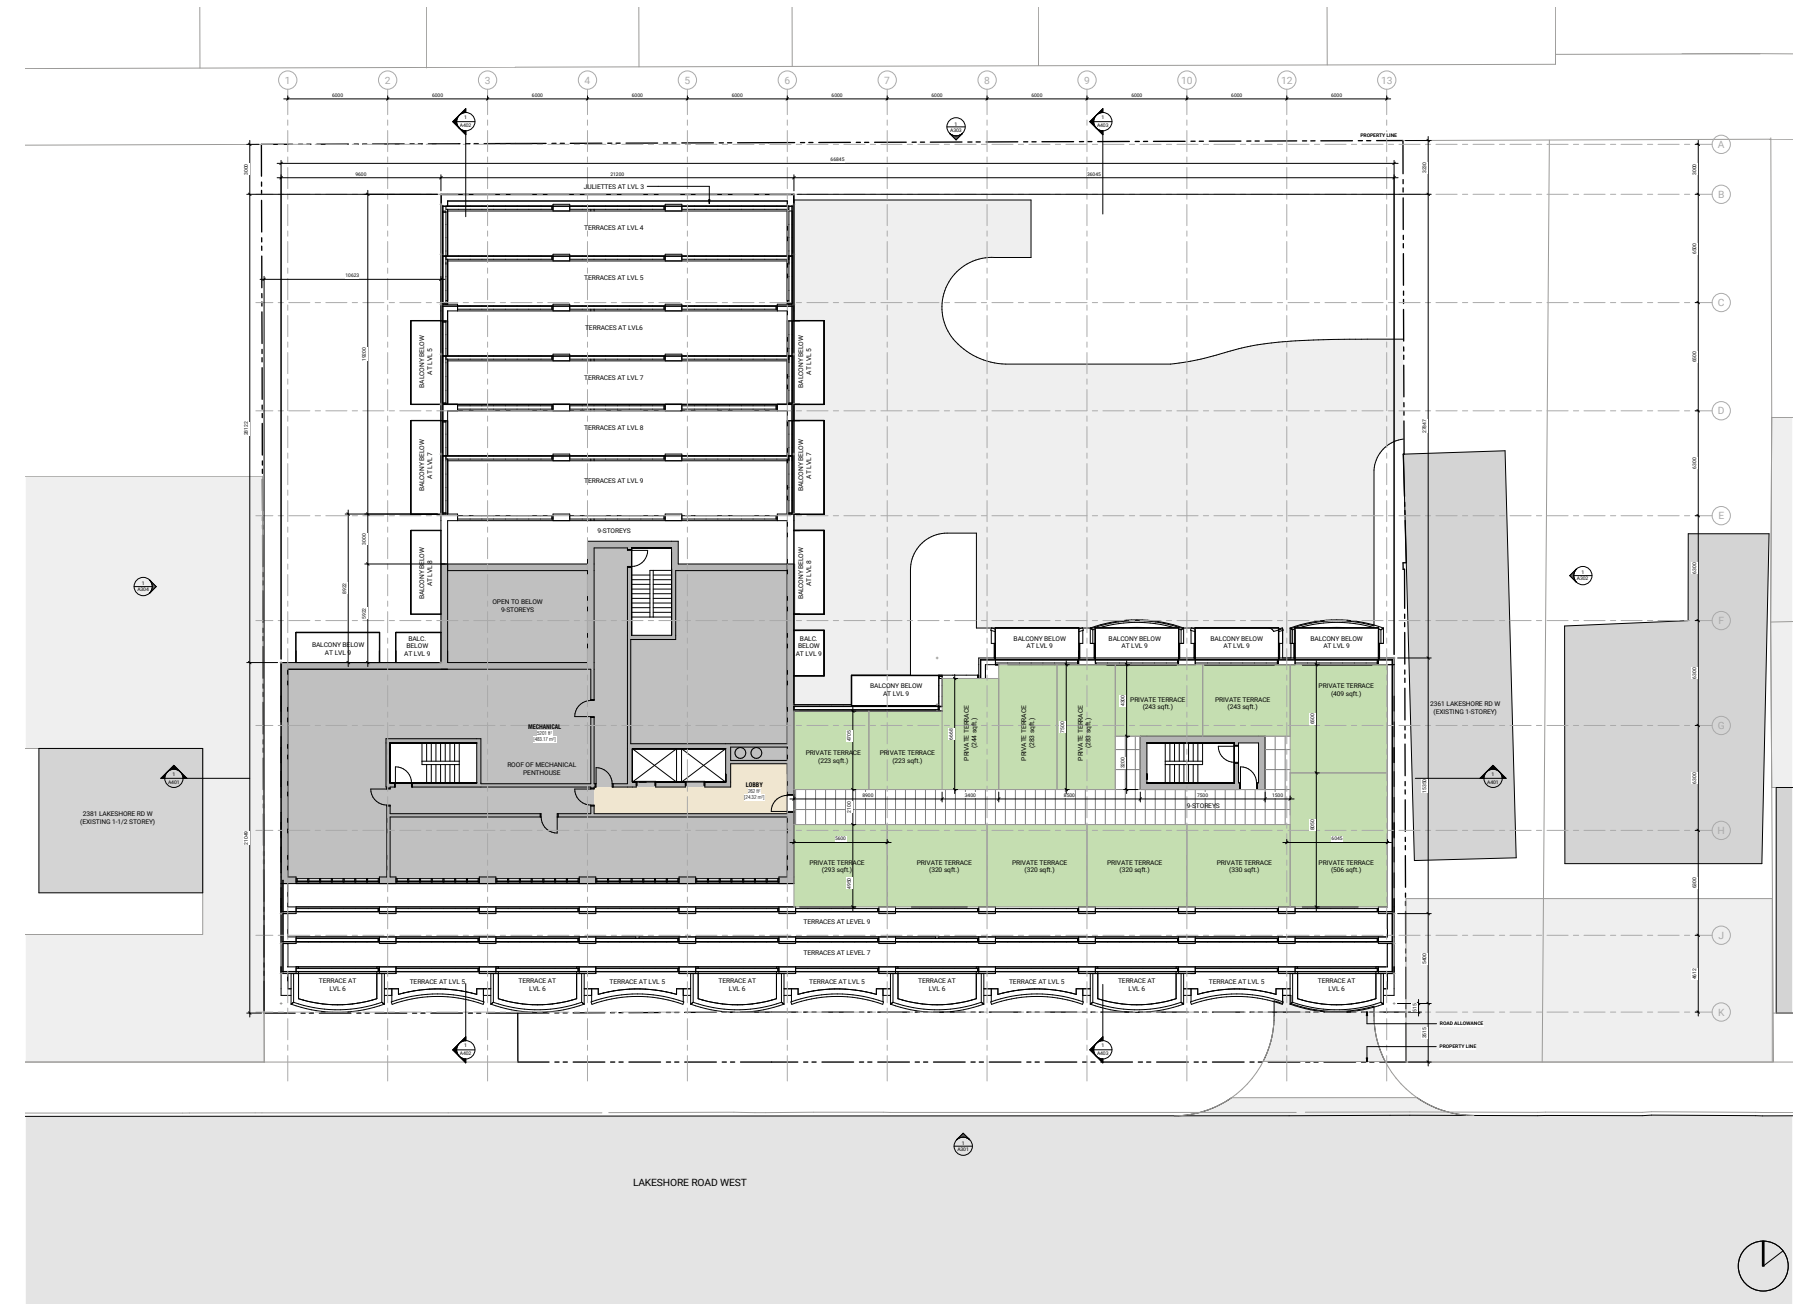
Roof Plan (Prepared by Diamond Schmitt Architects)
